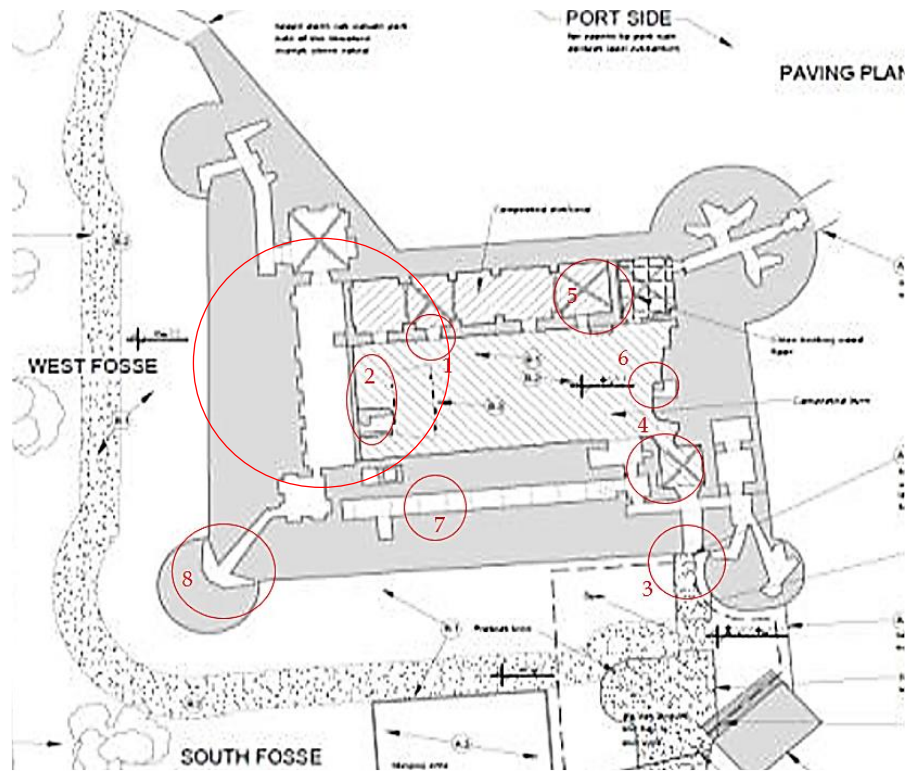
Schematic plan of Othello Tower, (UNDP-PFF, 2016)
